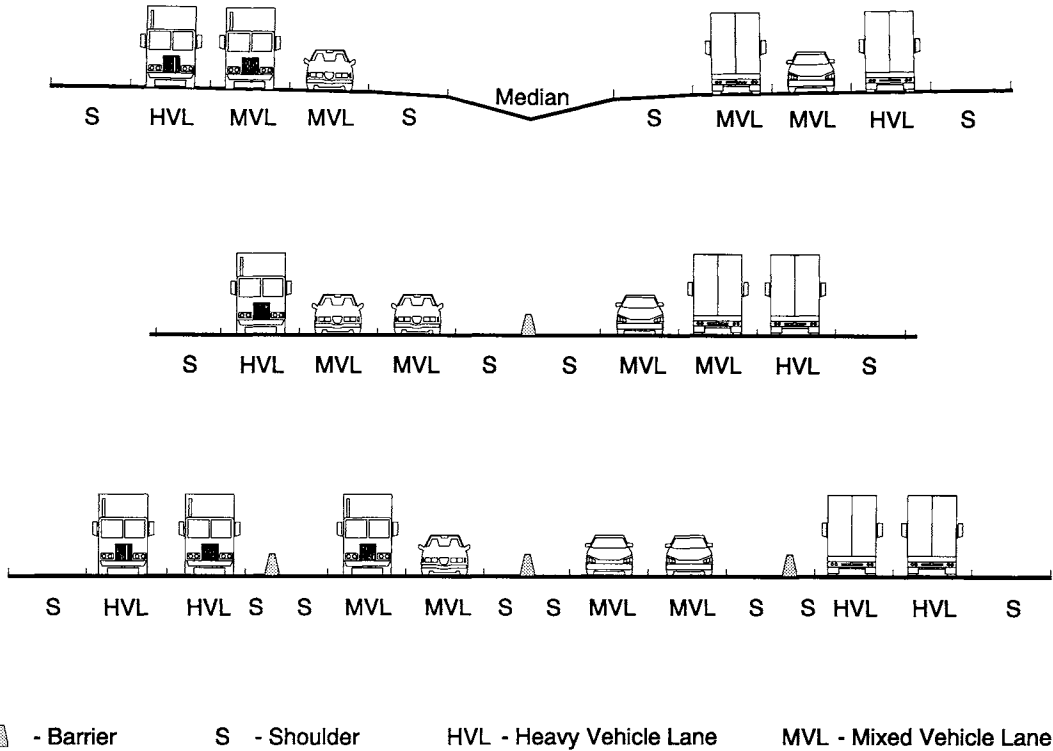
Outside lane: Heavy vehicles only (nonbarrier and barrier separated)
